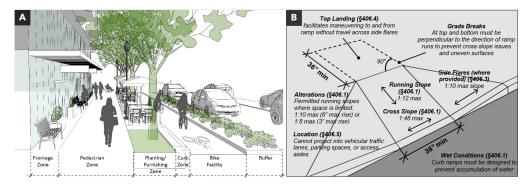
Illustrations of sidewalk and curb ramp design. Figure A shows City of Montgomery's Urban Design Guidelines on designing sidewalks [134]. US Access Board requires a minimum of 5ft width for Pedestrian Zones. Figure B shows the design of an accessible curb ramp [135].
